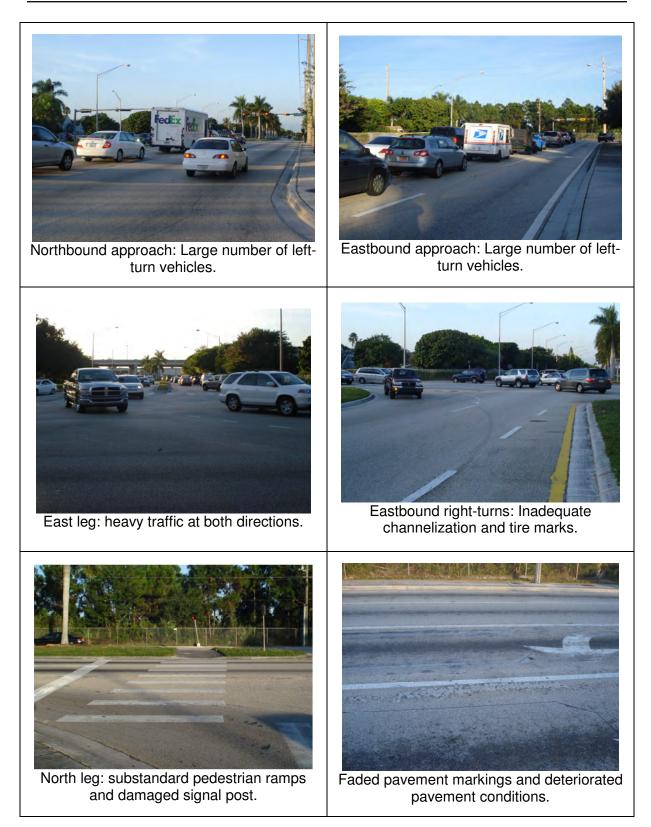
Field Review – SW 117 Avenue and SW 120 Street
